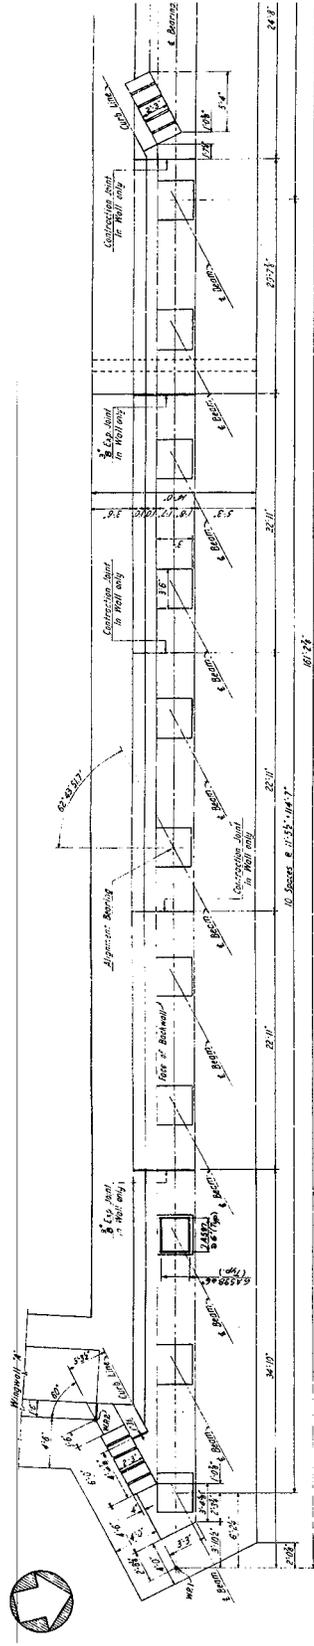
Anchor Bolts Location at Abutment Pedestals
